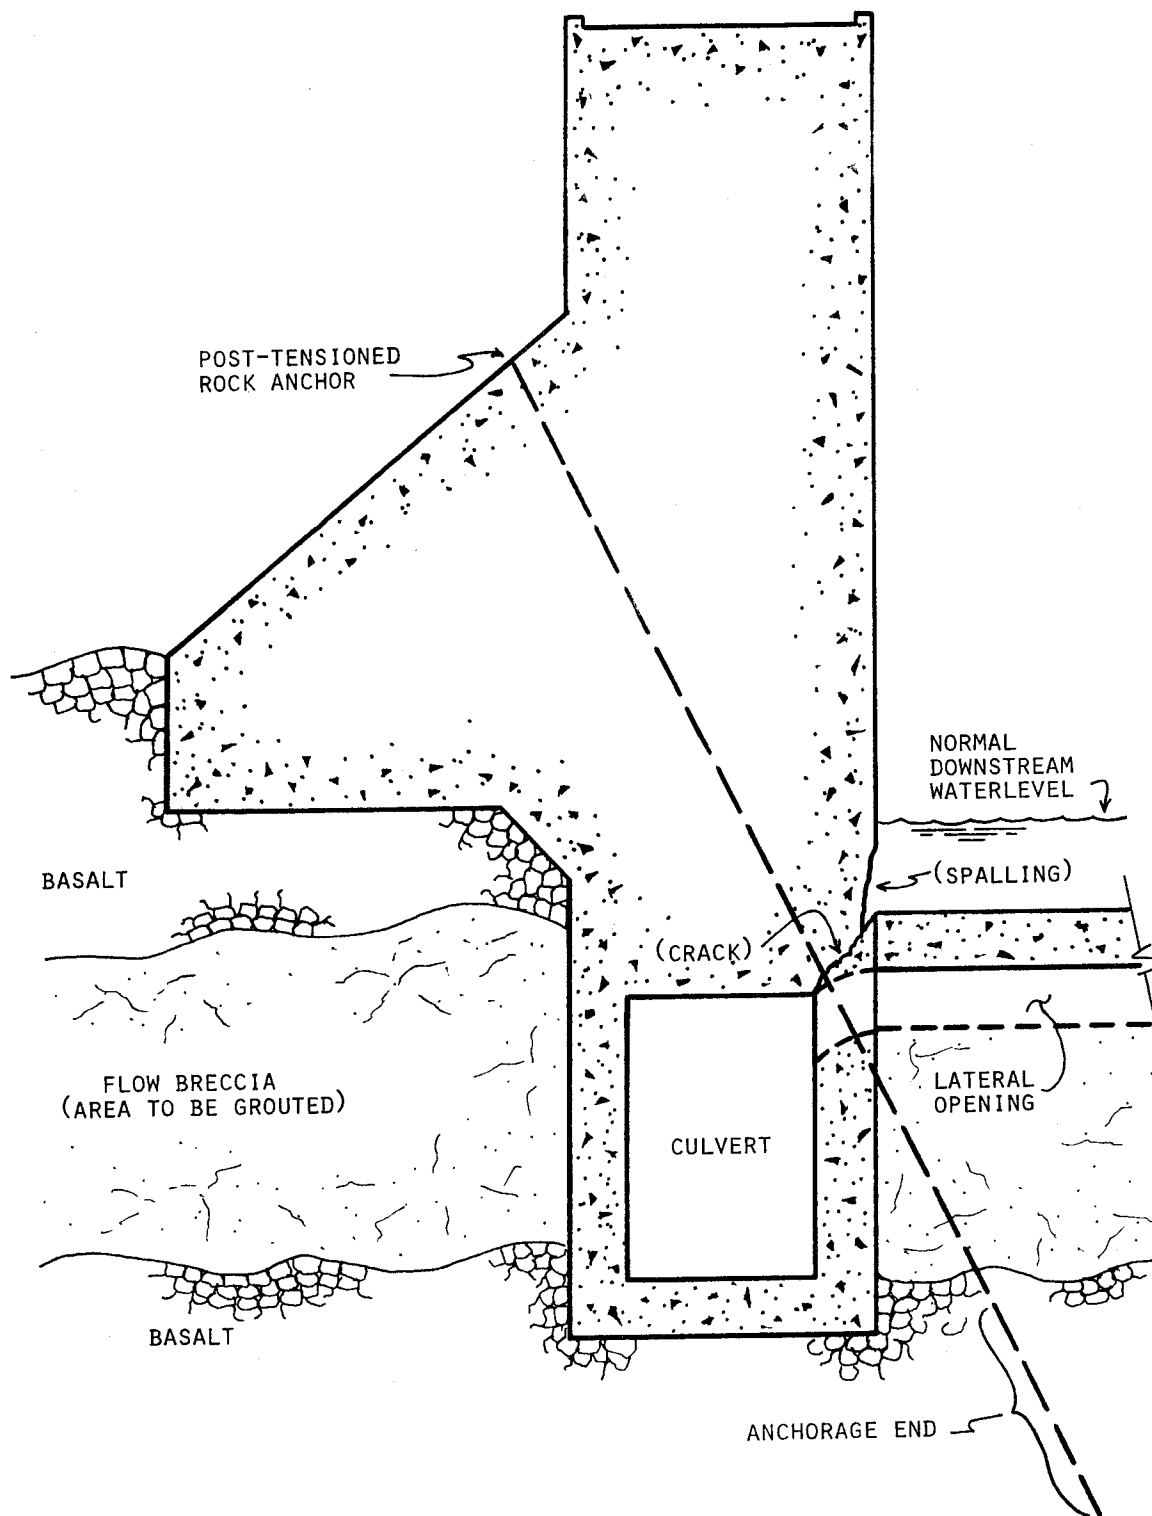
Cross-section of lock wall, showing details of crack location and supporting rock mass.
